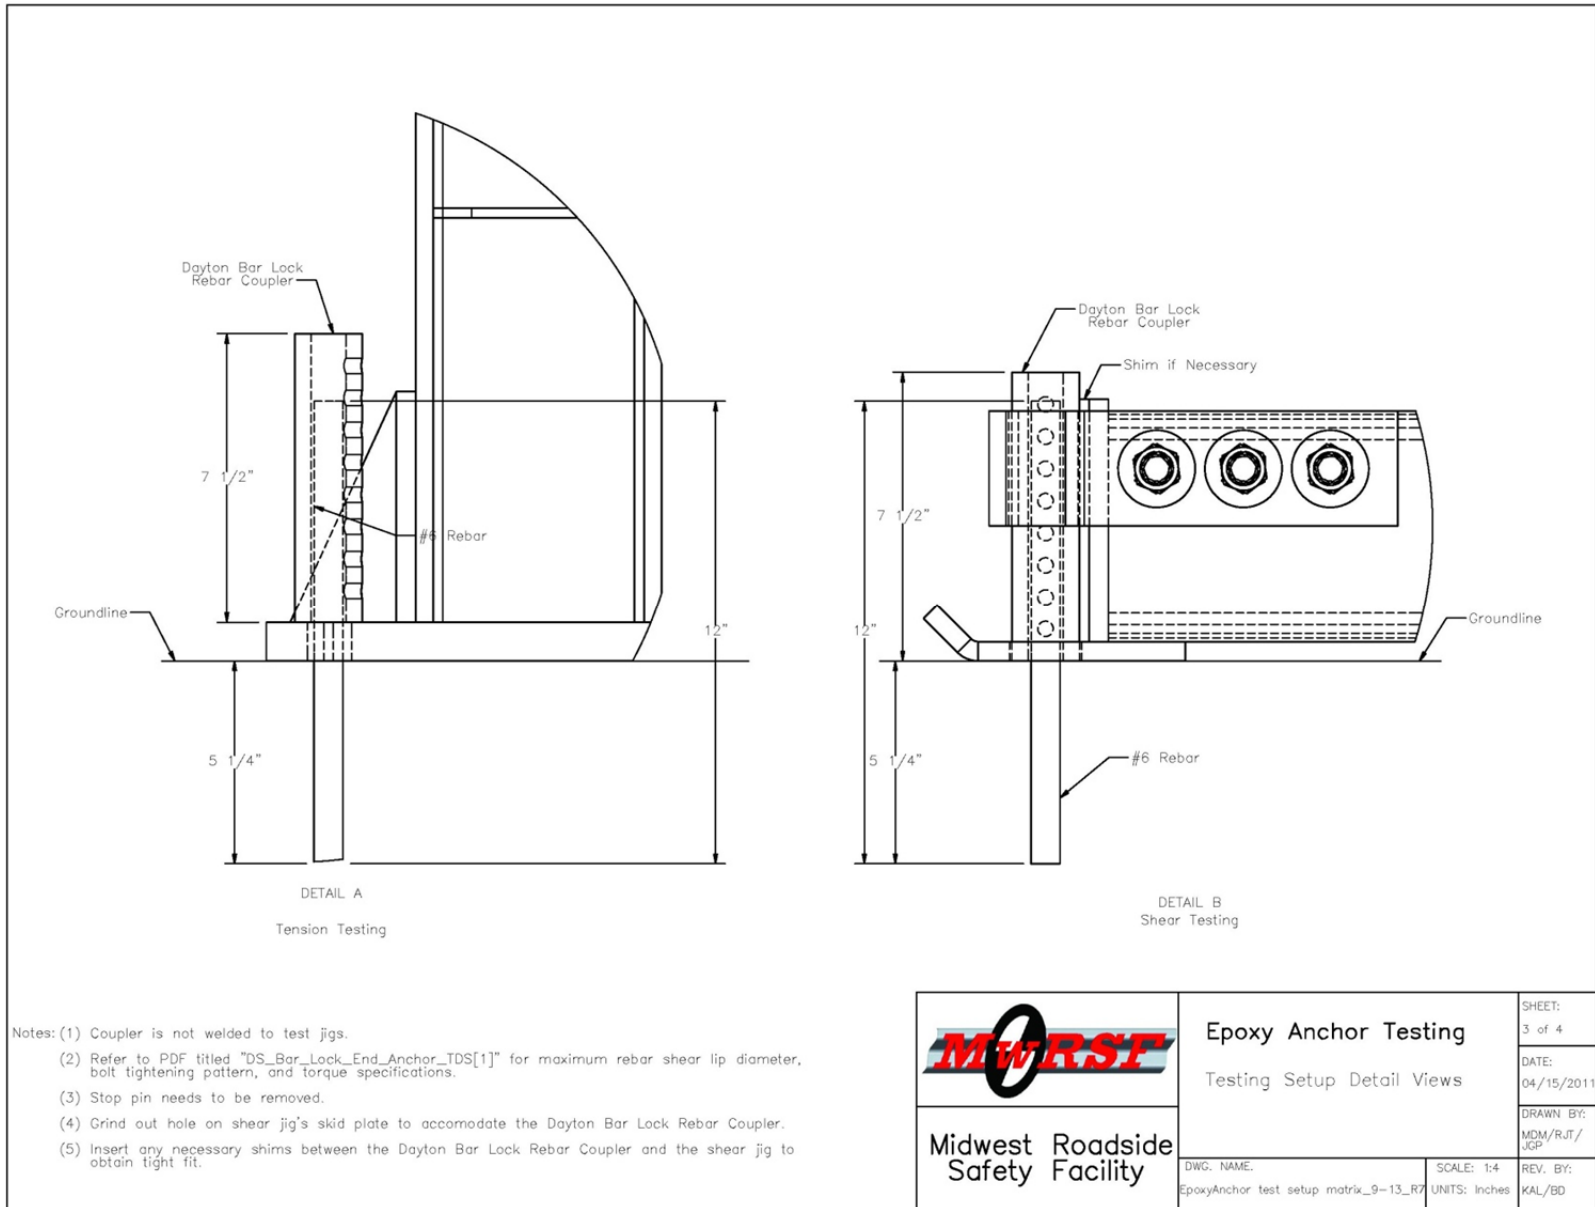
Anchor Attachment Details, Test Nos. WEAB-9 Through WEAB-13
